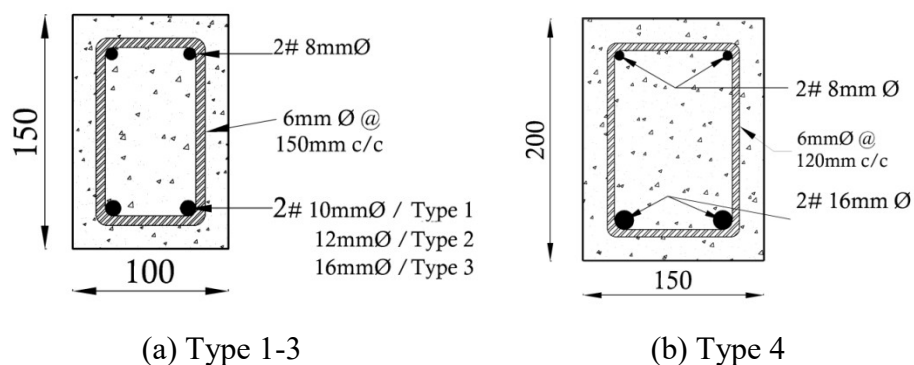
Typical cross section and reinforcement details of all types of RC beams
